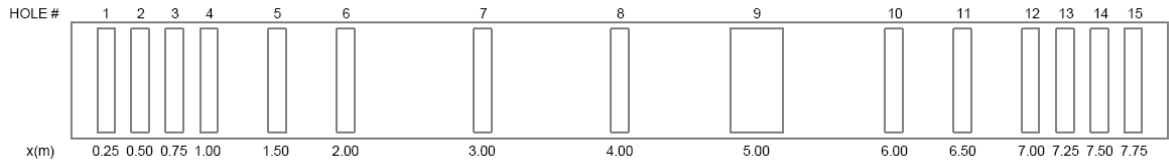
Plan view of culvert showing location and size of culvert access holes.
